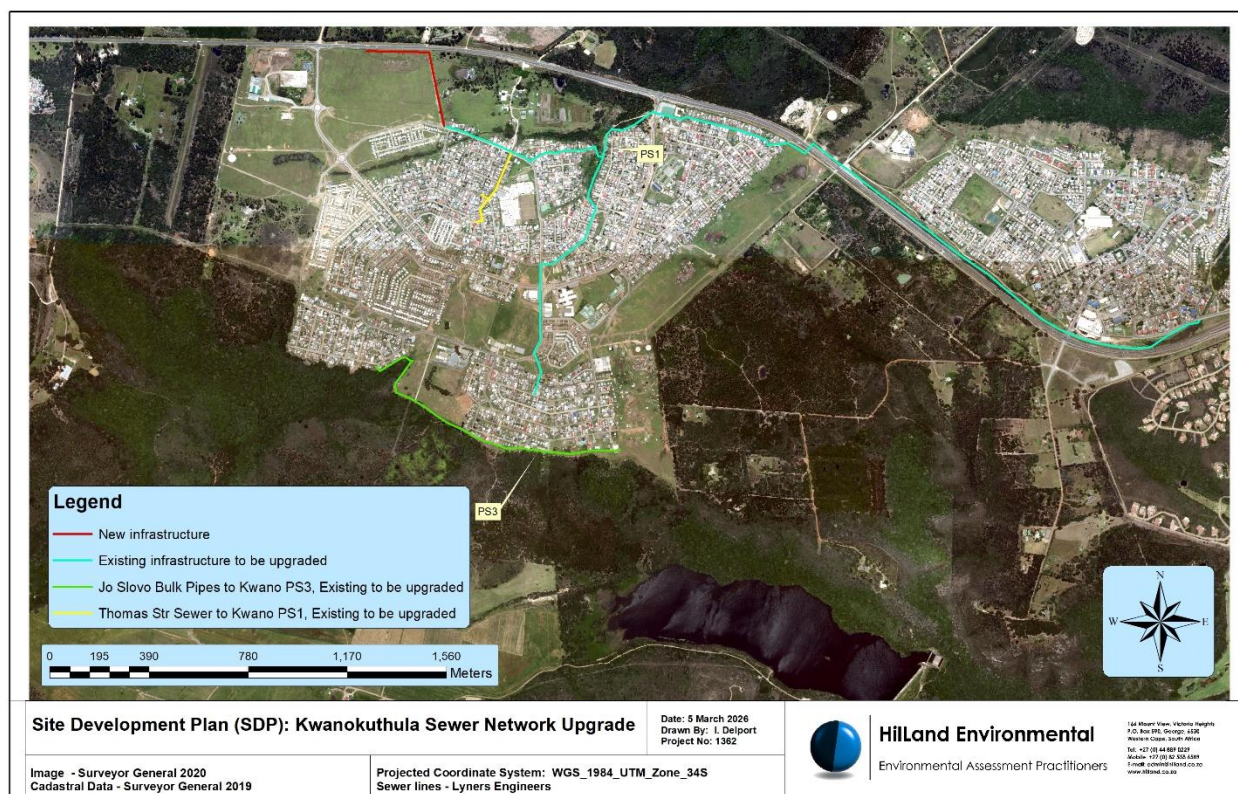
Plan showing all the pipelines that will be upgraded and new pipeline to be installed to future development areas
